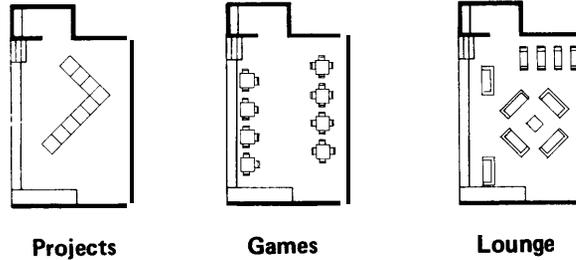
Open Multipurpose Space Alternative Use Plans
